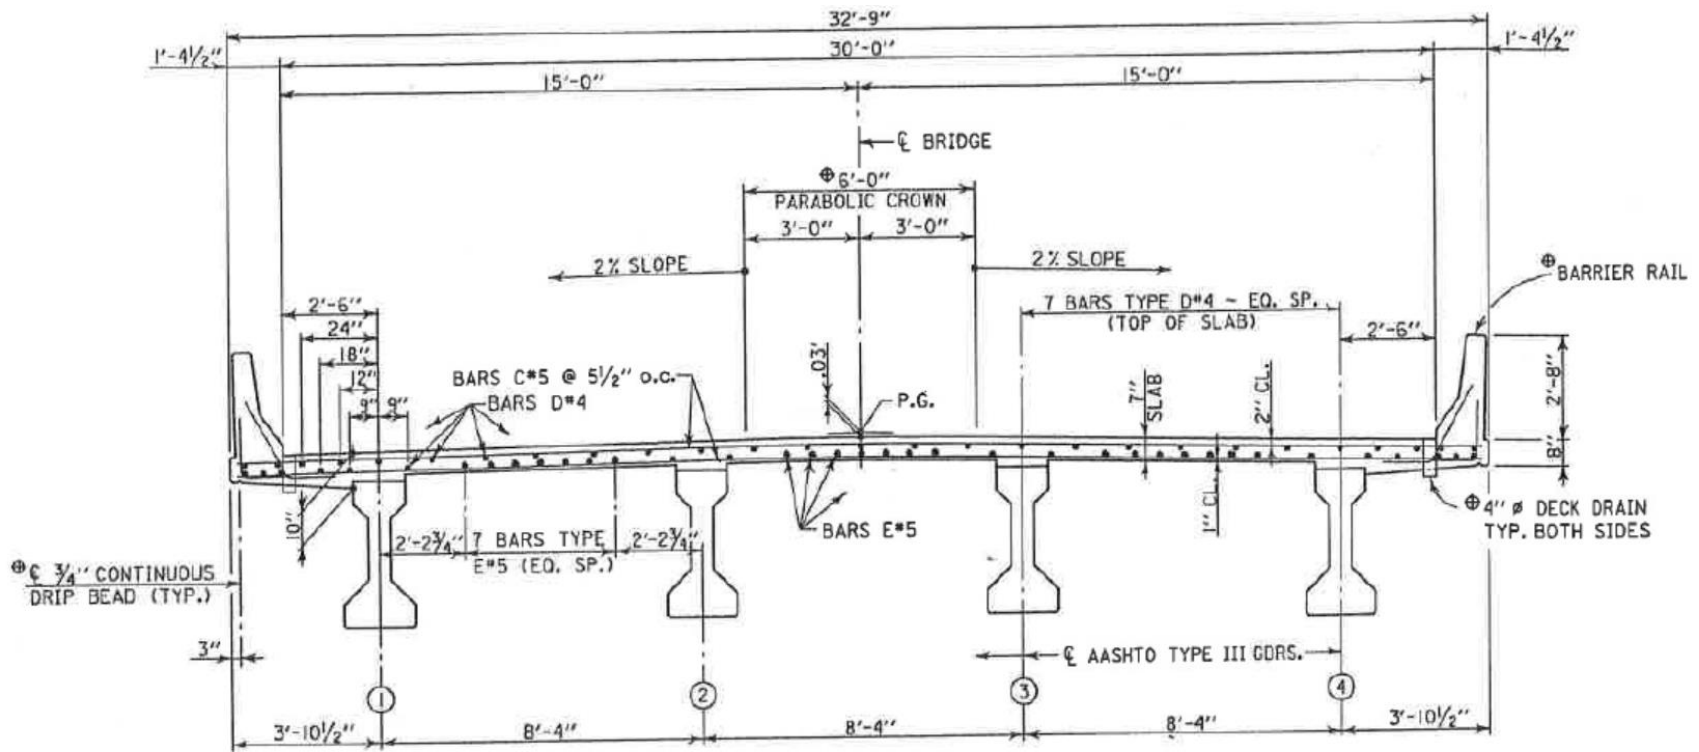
Chambers County bridge plan and elevation view (ALDOT 2008)
